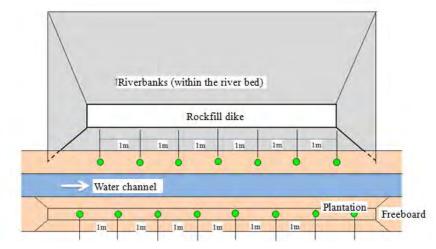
Arrangement plan of afforestation in bank structure (Type B)
